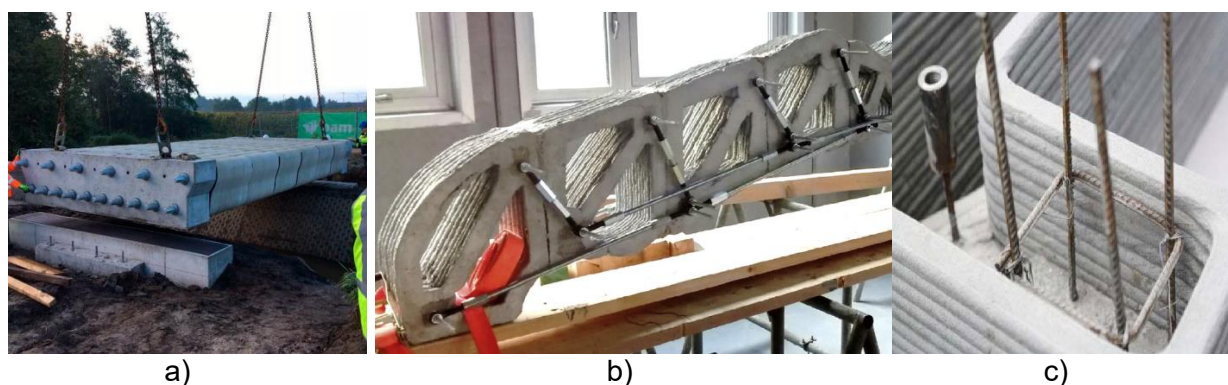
Reinforcement integration after concrete printing with a) post-tensioned bars [34], b) external reinforcement system [36], and c) pre-fabricated cages [37].
